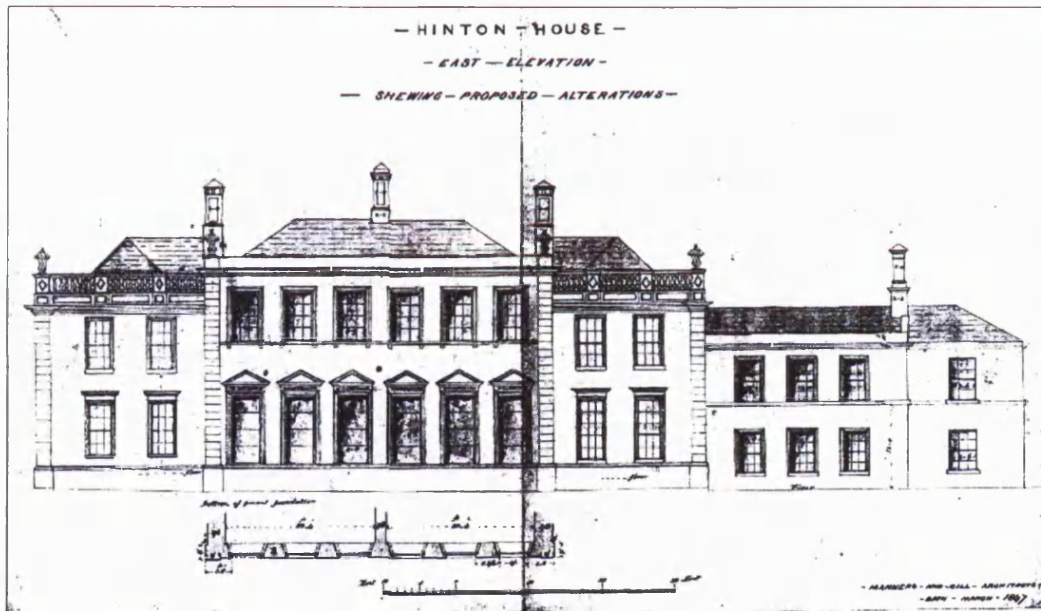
Hinton House, East Elevation 'showing proposed alterations' Signed: Manners & Gill, March 1847.
